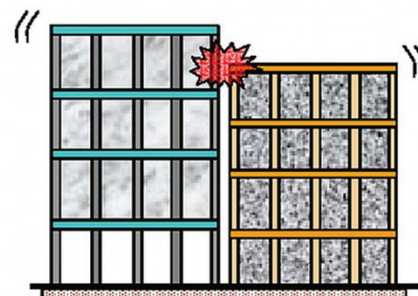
Pounding can occur between adjoining buildings due to horizontal vibrations of the two buildings
